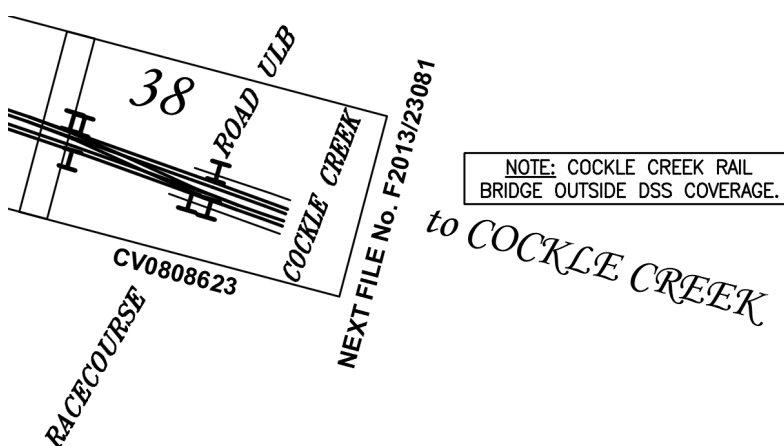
Cover Plan Next Plan Set Information Text & Area Specific Note
